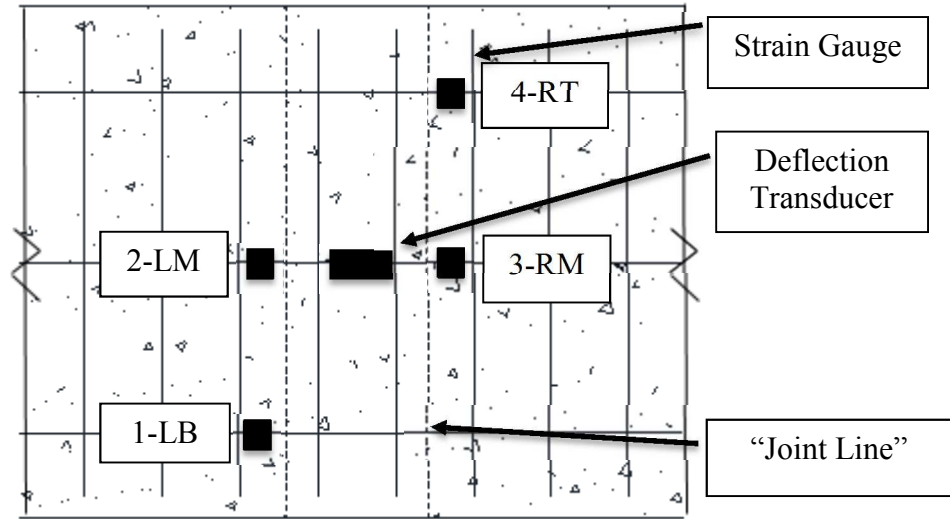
Embedded Instrumentation for Jointless Specimens
